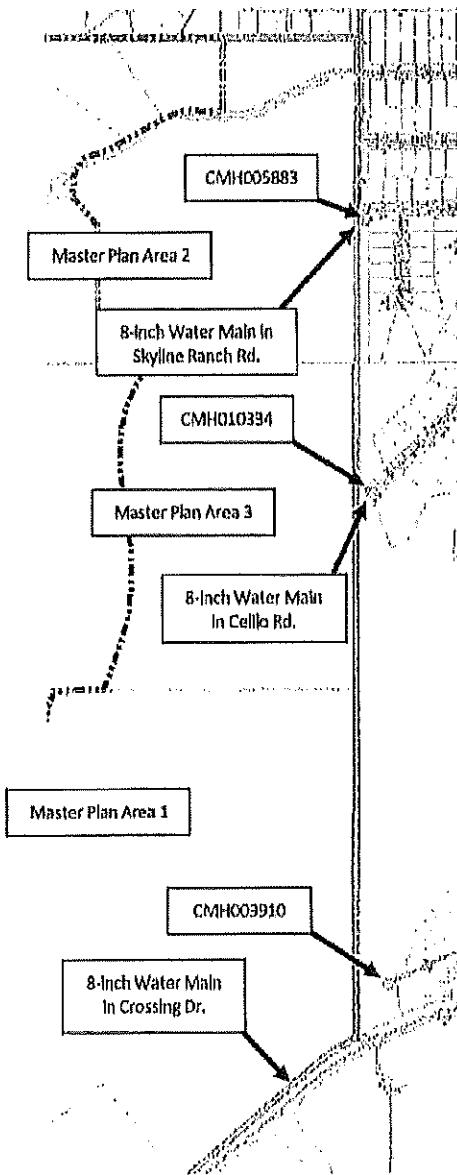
Master Plan Areas 1,2, and 3 Potential Connection Points
